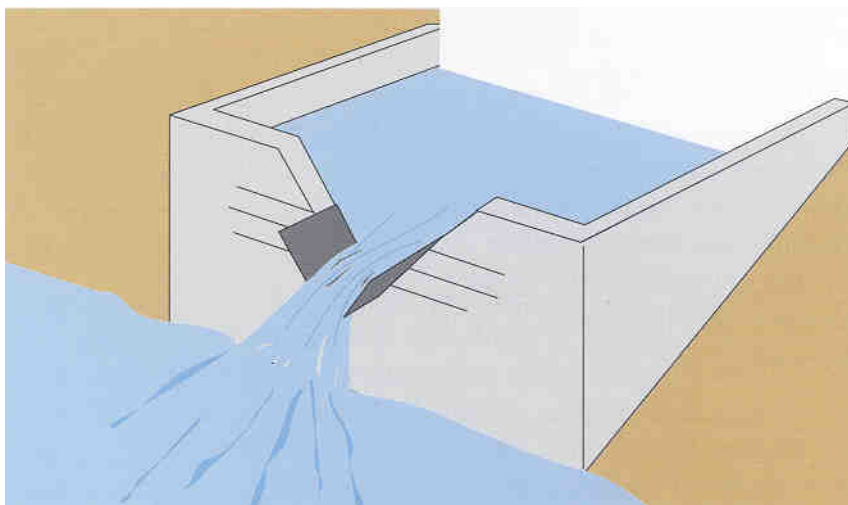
Weir board placed in a dam crossing the tunnel floor (Pettersson & Molin, 1999).
